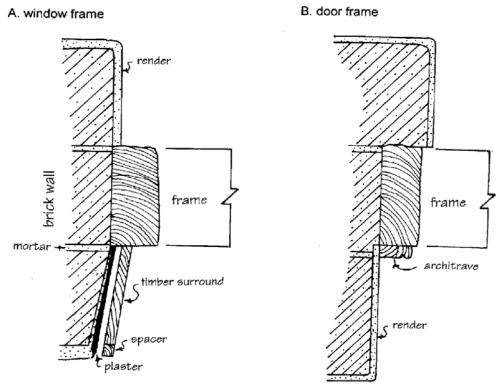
Assembly details of window and door frames, central room, Pontville. Hand-made finishing brads are used to attach the spacer strip and architraves shown here.
